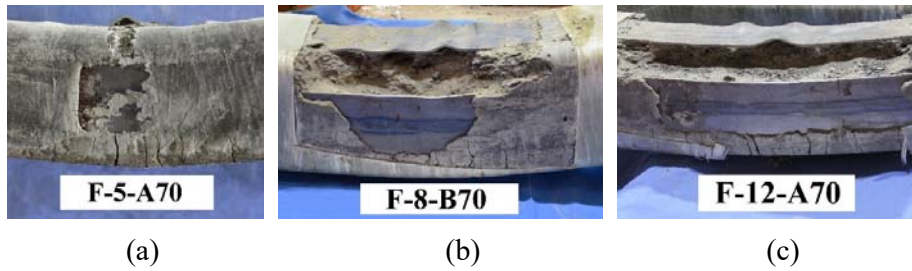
Small ripples on the steel sections at the failure of some typical specimens
